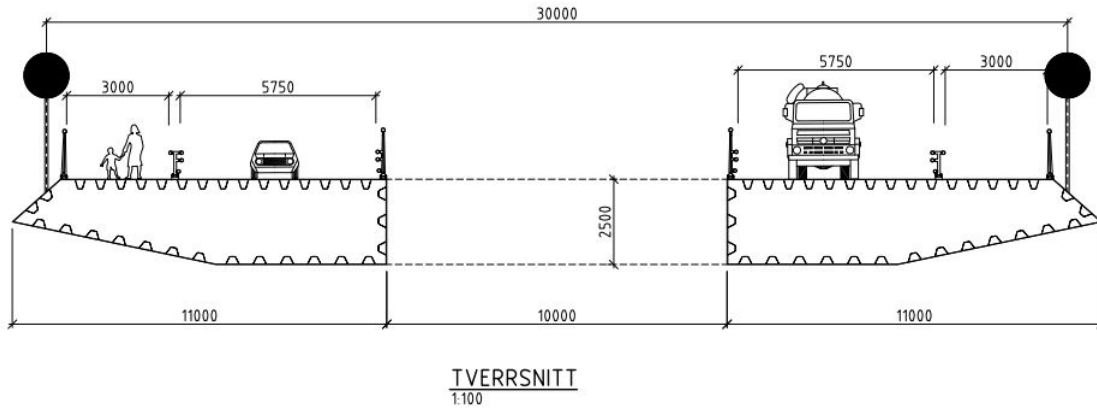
Bridge deck of the proposed Halsafjorden bridge [16]
